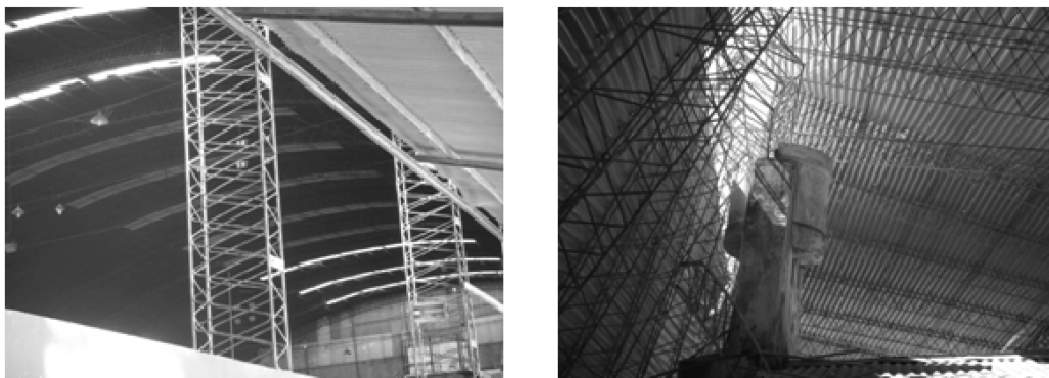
Details of lattice structures made with steel rods. Left: The supporting columns of a 35-m spanning roof; right: the collapsed frames of a 20 m \times 45 m vaulted canopy roof
